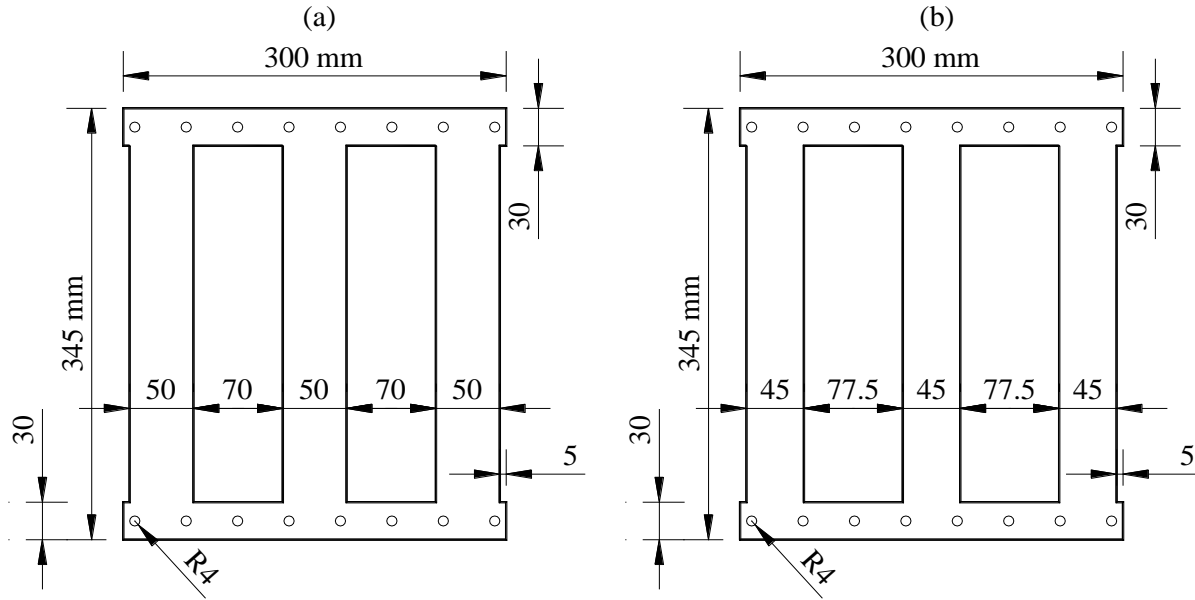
Column shapes for the lab-scale five-story building structure: (a) undamaged and (b) damaged states (units: mm).
